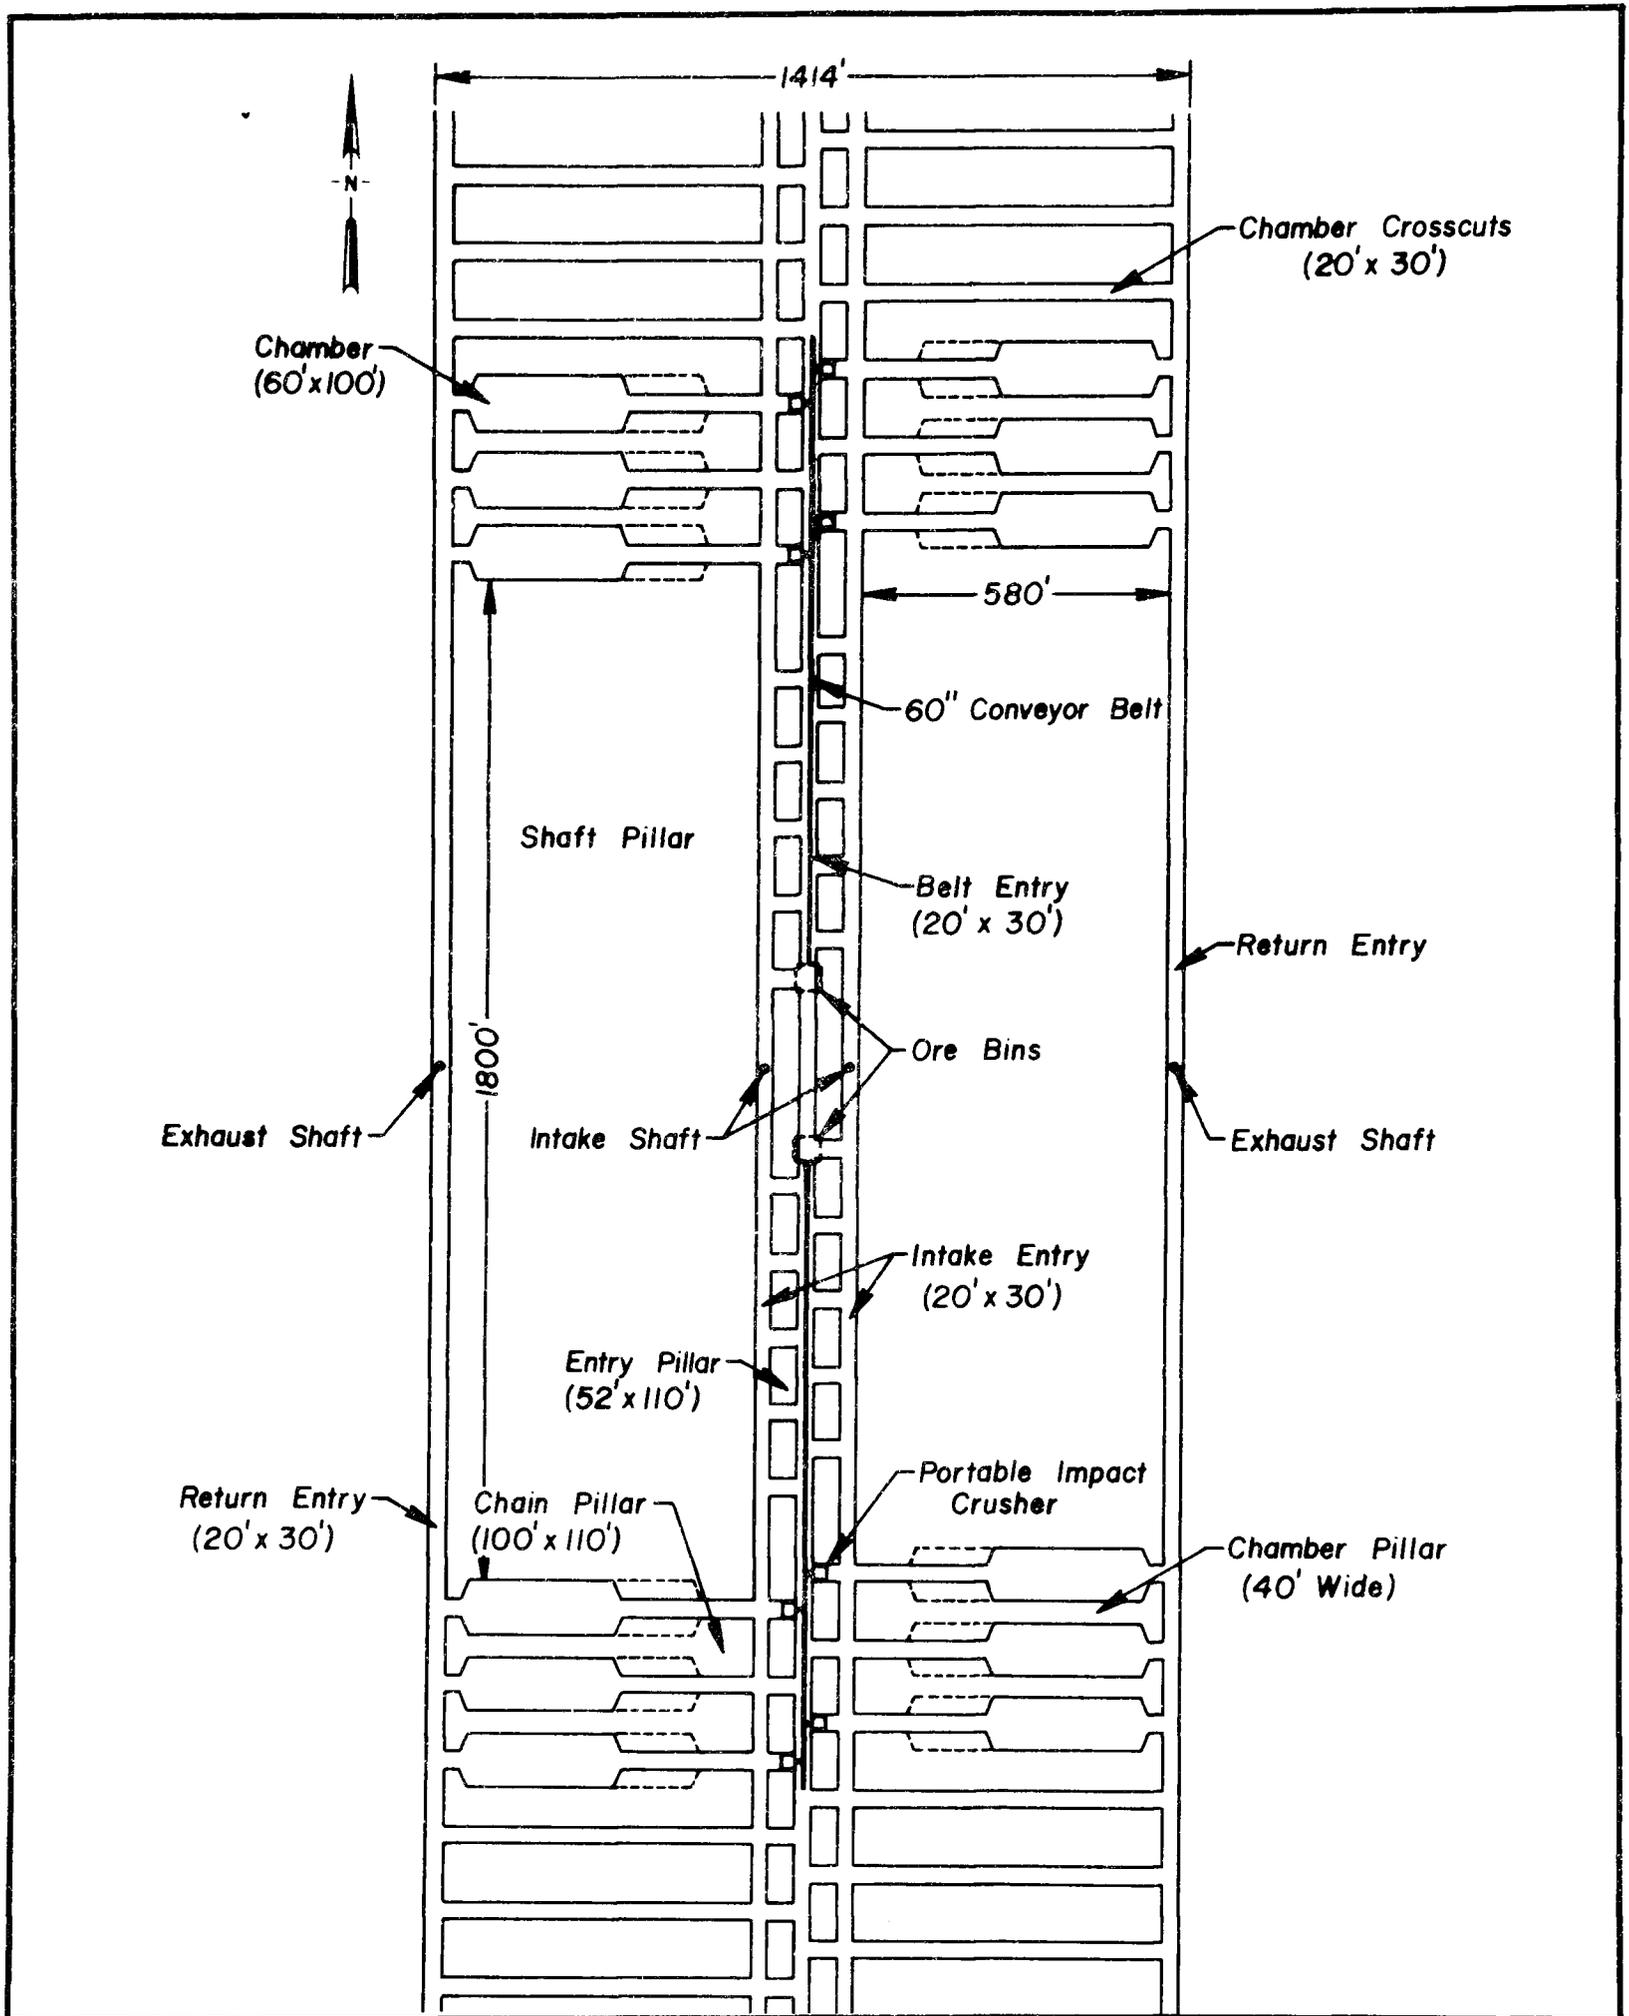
Plan View of Production Layout, Chamber and Pillar Mining
